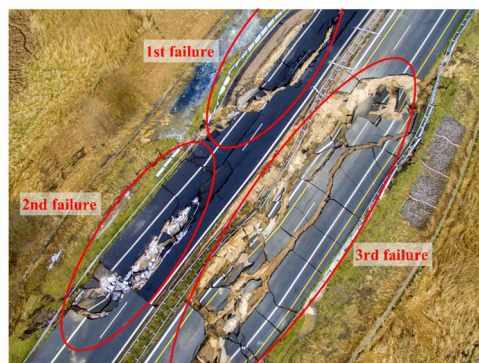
Damaged areas west of the Trebel bridge (Image source: OSTSEE-Zeitung / Alexander Müller)
